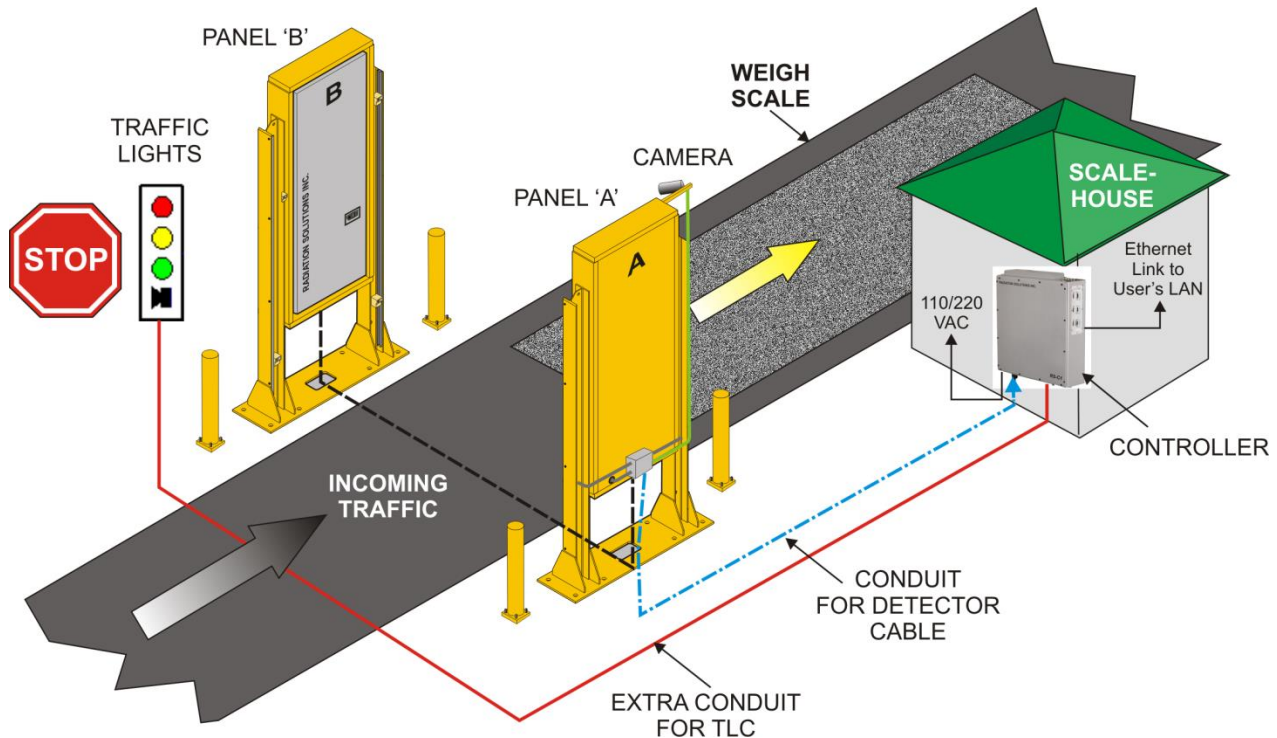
RS-300/400 Site Plan (2 Detector System)
